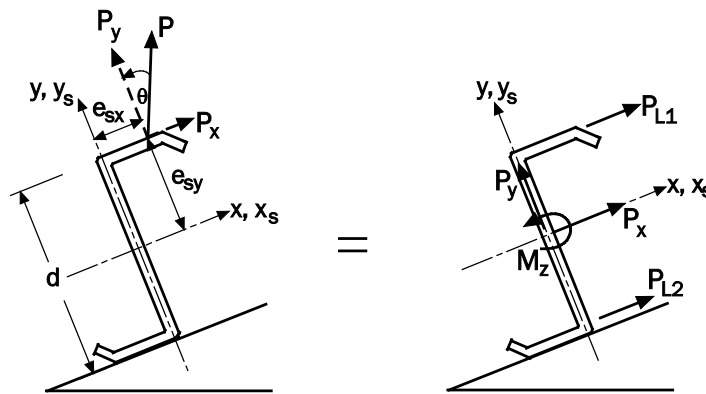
A Z-Section Member Subjected to an Arbitrary Load
